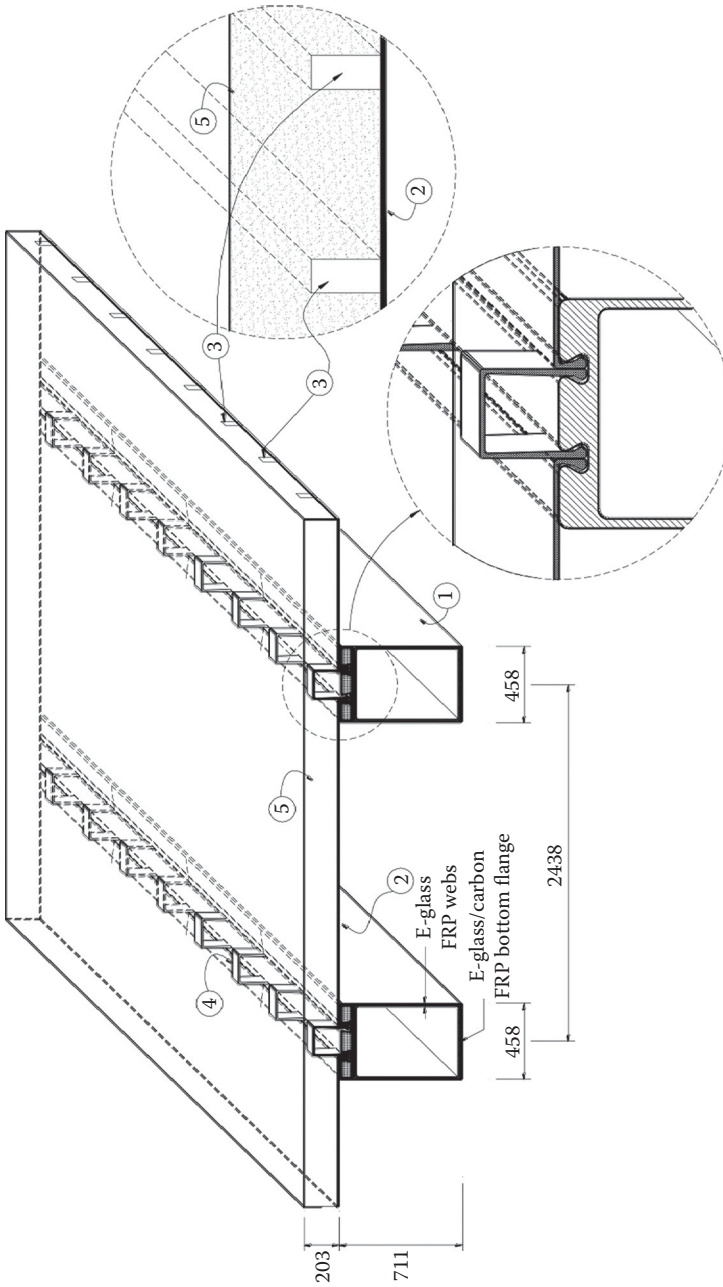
FRP girders connected to a concrete deck. ① Hybrid girder, ② Bottom skin of deck panel, ③ Stiffened ribs of deck panel embedded in concrete, ④ Shear stirrup, ⑤ Fiber reinforced concrete deck.
